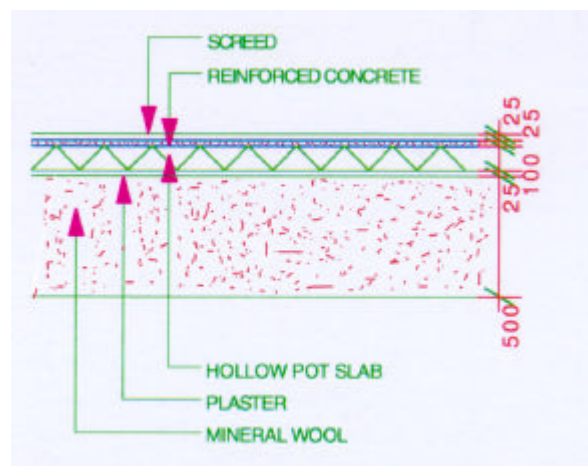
Assumed Floor Slab Construction (Adiabatic Slab)
